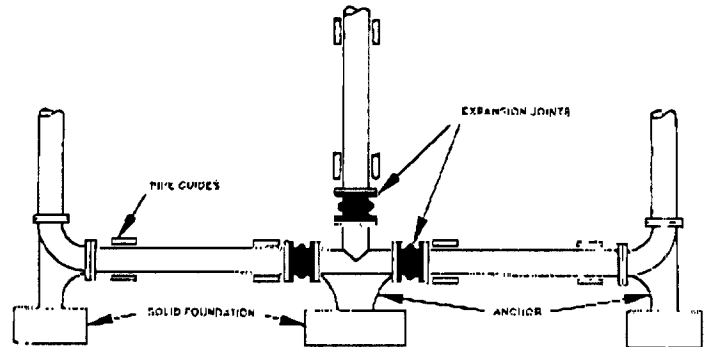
B: Typical Piping Layout Utilizing Expansion Joints And The Proper Use Of Anchors In Branch Locations
